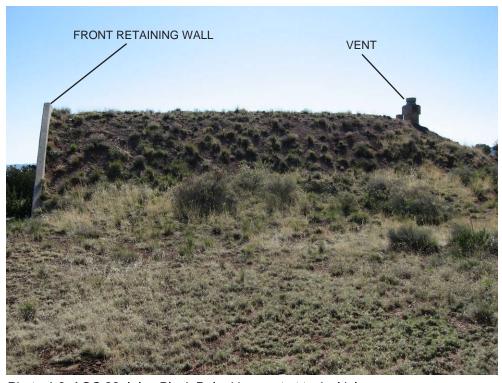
AOC 30, Igloo Block D, looking east at typical igloo.
